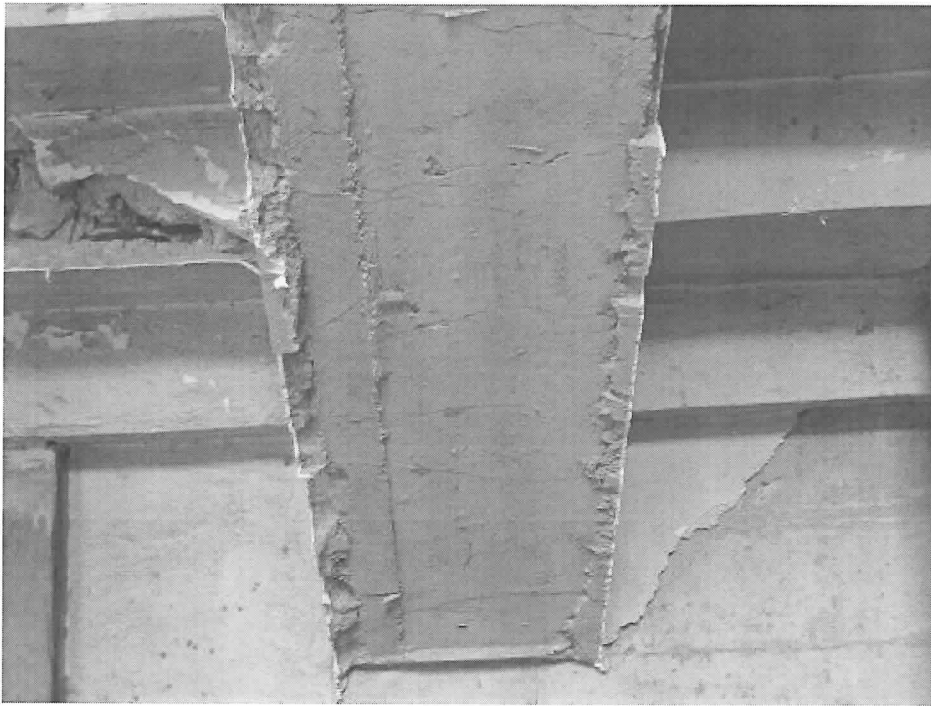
Many horizontal cracks appeared at the bottom of the stair beam
